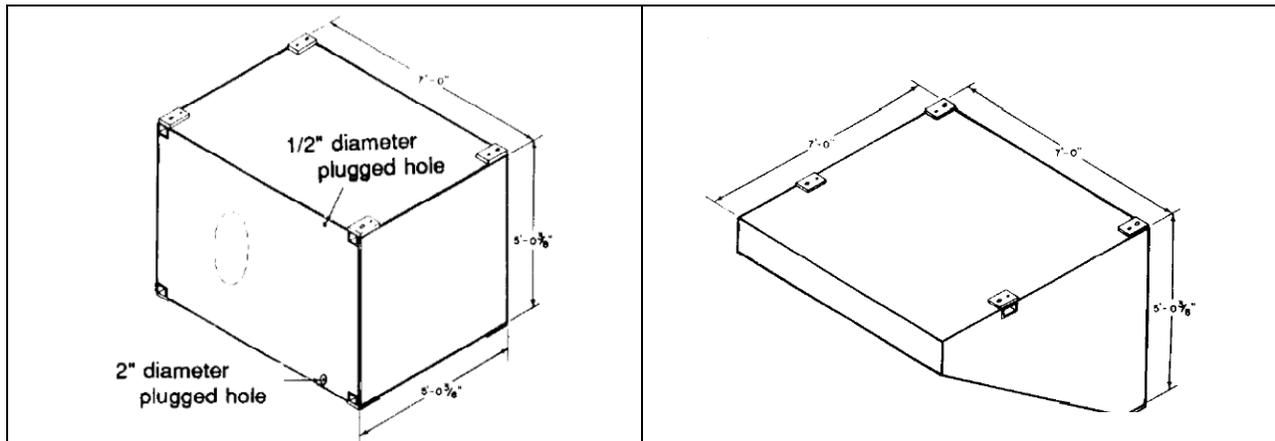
US Navy P1 (right) and P2 (left) Pontoon Sections
